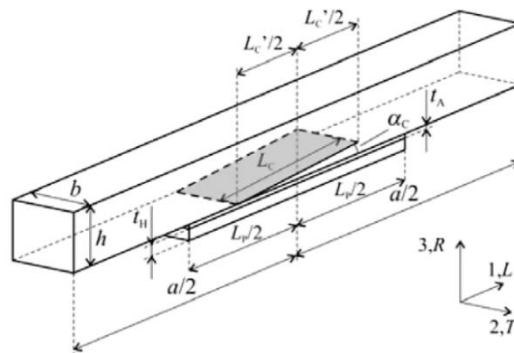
Schematic geometry of the cross grain tension repair specimen used by Campilho et al (8).
